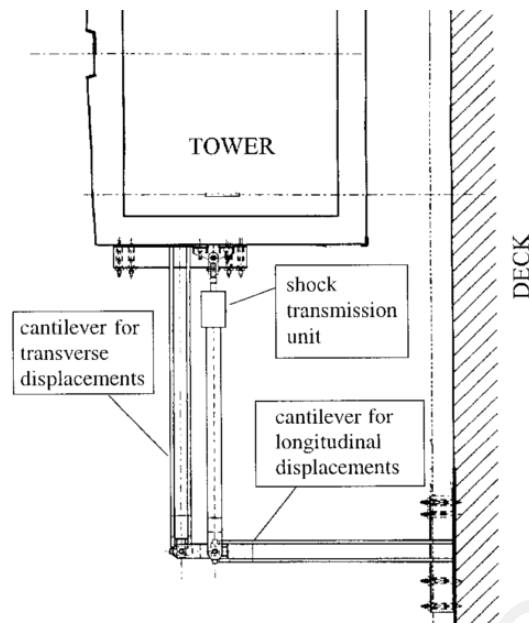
Plan view of proposed damper for the Vasco da Gama cable-stayed bridge
